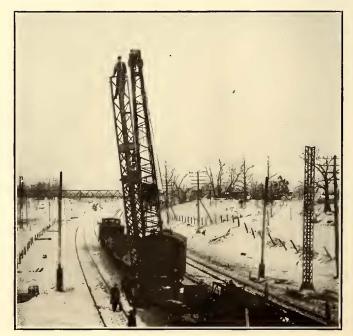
END VIEW OF CONSTRUCTION CRANE
